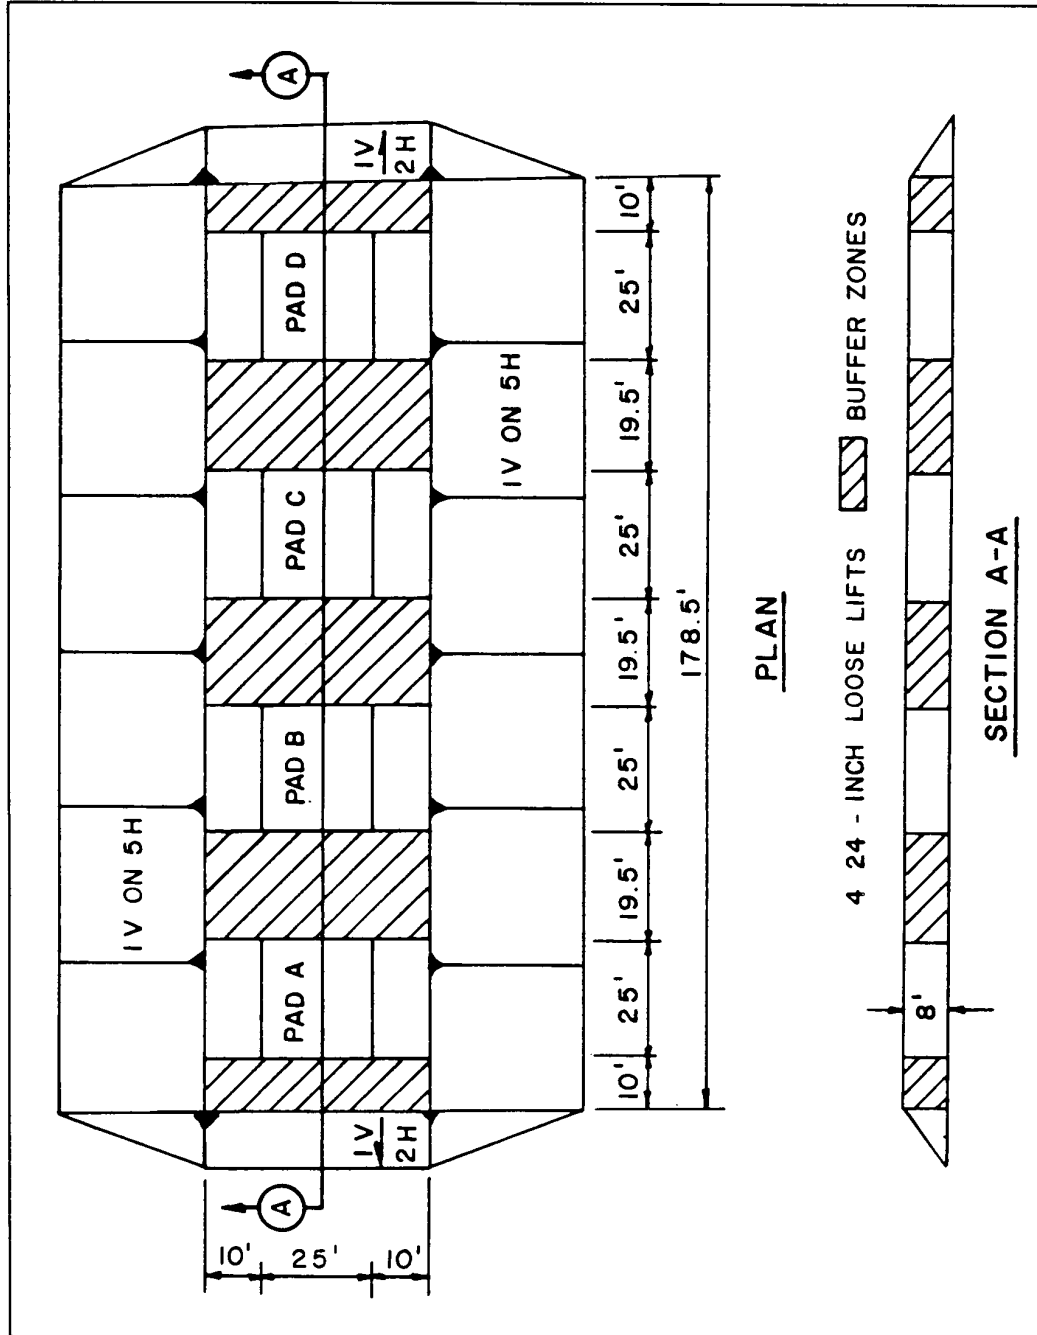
Cerillos Dam, plan and profile of test fill No. 3
